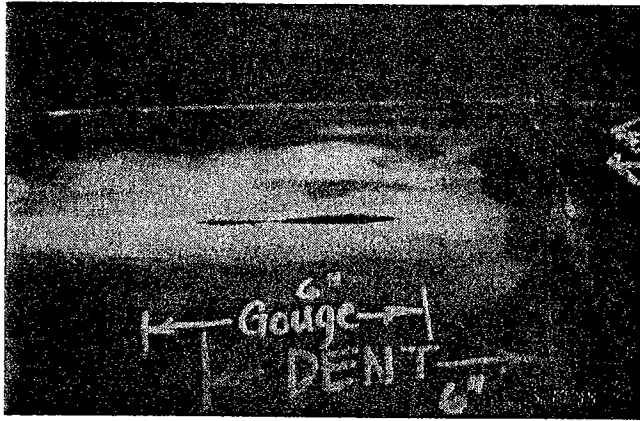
Inspection of Specimen A2-3 After Removal of Clock Spring
